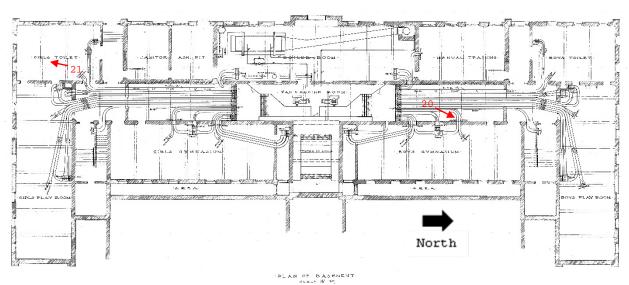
Ground Floor Photo Key (Floor Plan Courtesy of St. Louis Public Schools).
